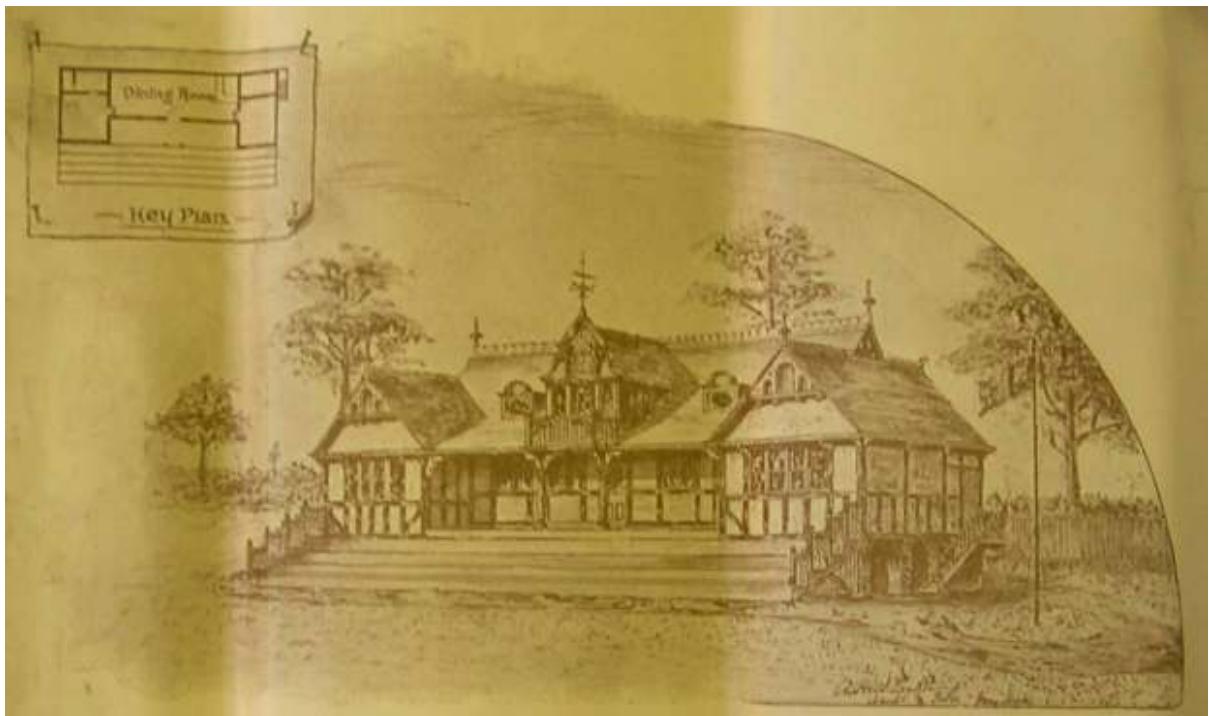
The Pavilion, illustrated on original plan, Alfred Hill Parker, C. 1896
